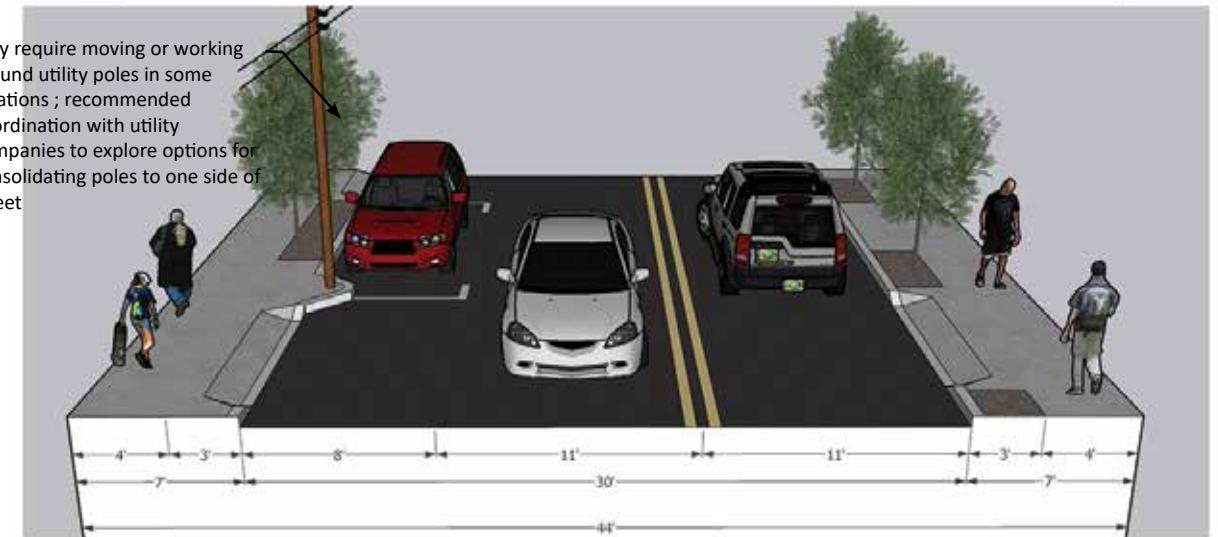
Main Avenue : Willett Street to Forest Road Design 1 (Option 3) Concept Cross-Section
